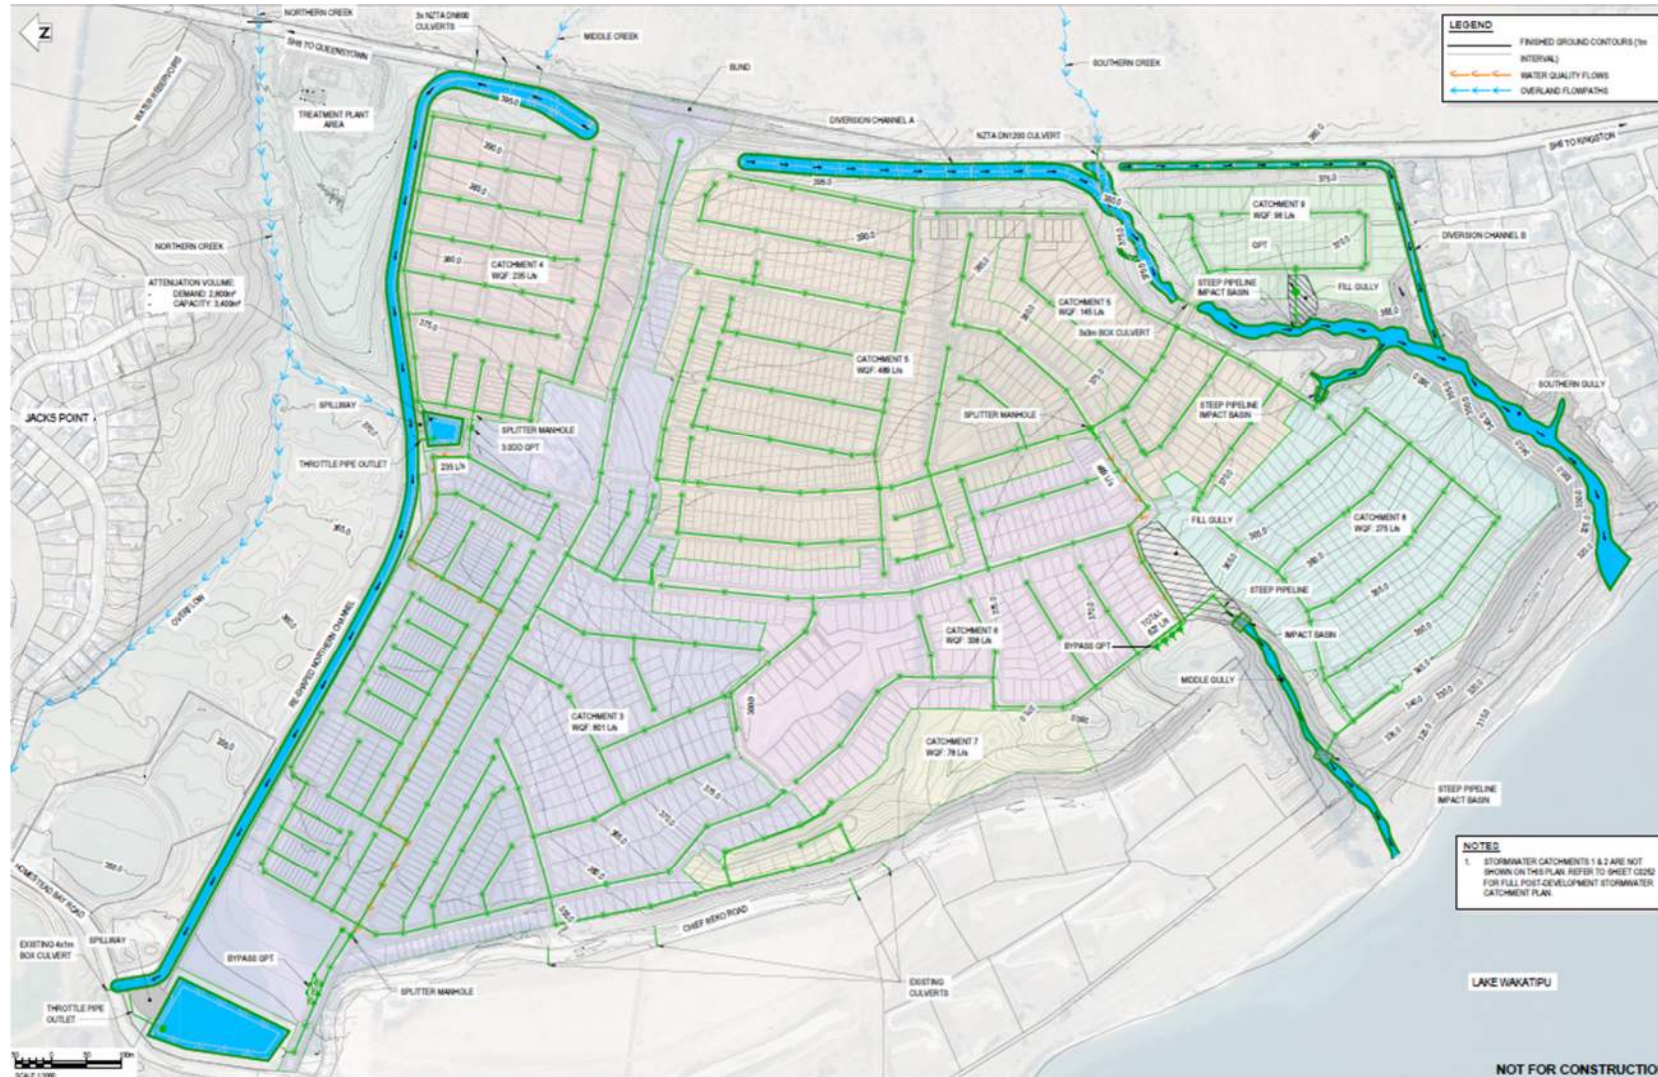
Stormwater Drainage Scheme Plan (reference to project drawing C0253)
